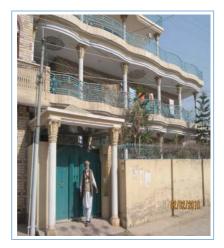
Typical non-engineered buildings in Pakistan (Photos by Designmen Consulting Engineers (Pvt) Ltd/ETSSR Center, Pakistan)
